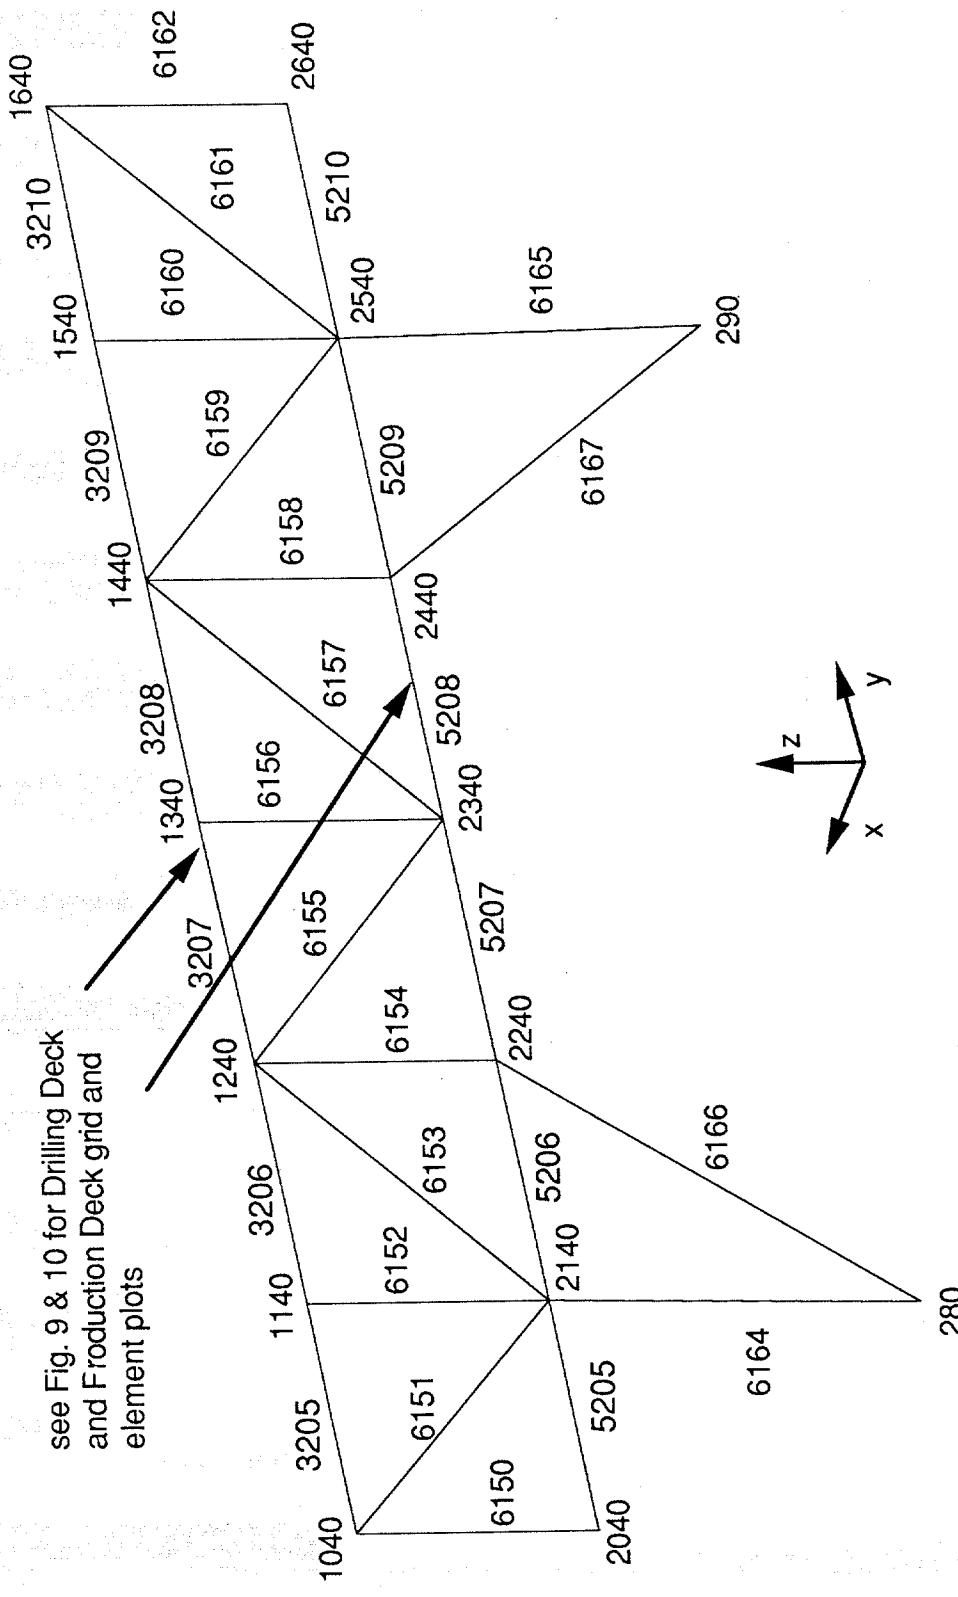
Row 2 Elevation Element and Grid Point Numbers
